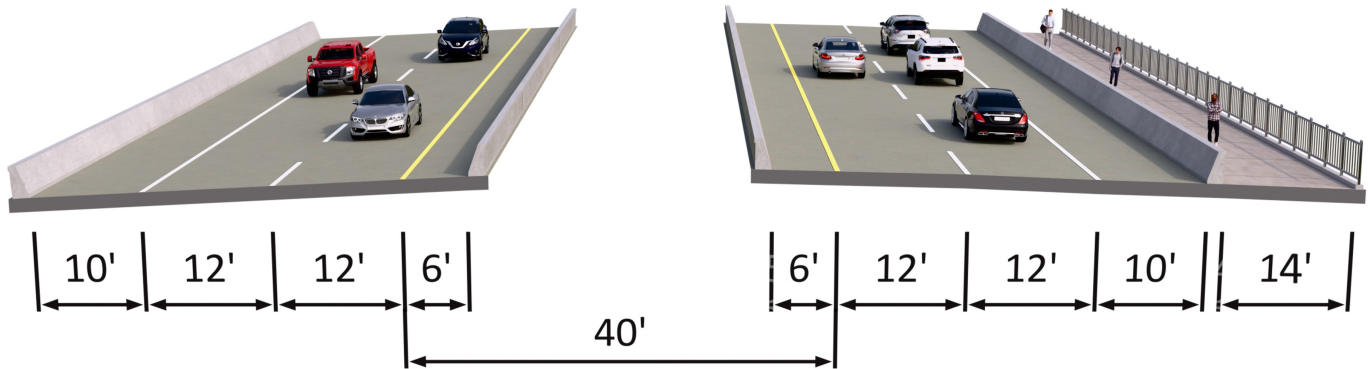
Preferred Alternative Bridge Typical Section - S. R. 70 over Indian Prairie Canal C-40
